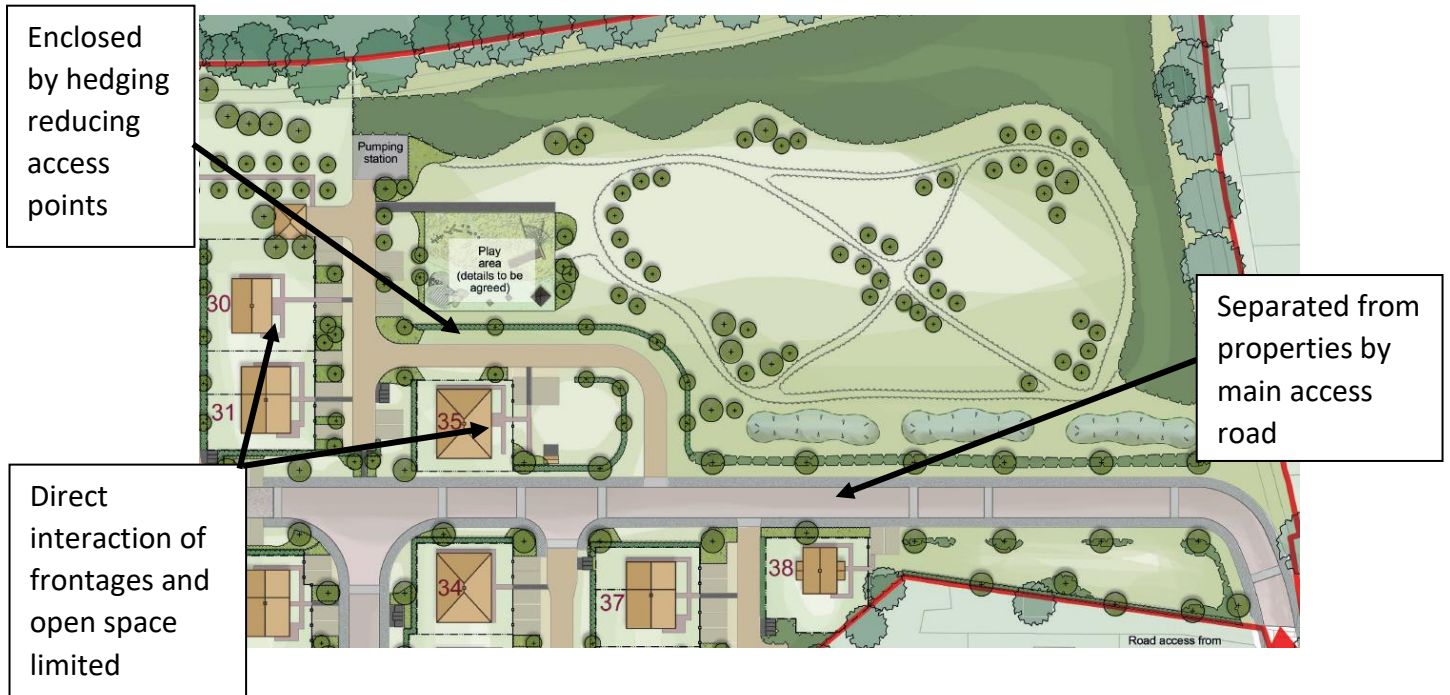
Extract from the Site Layout Plan showing the open space on the north-eastern side of the site
